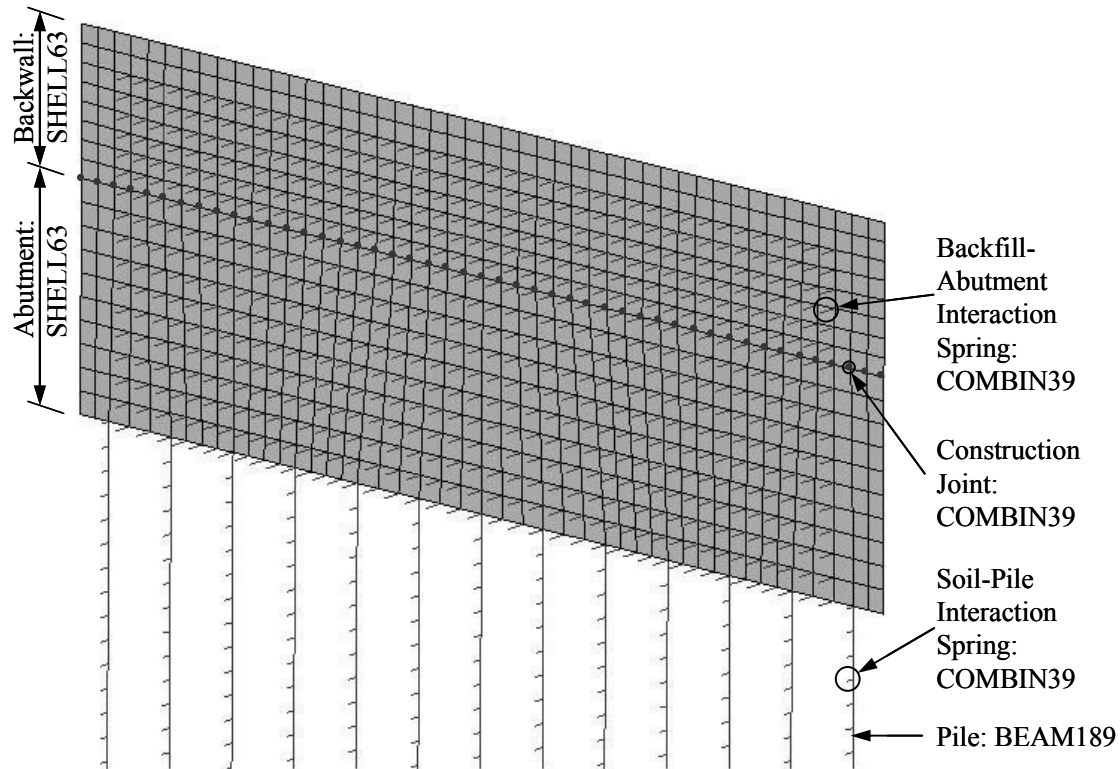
Example 1 3D Abutment and Back-wall – Viewed from Backfill
